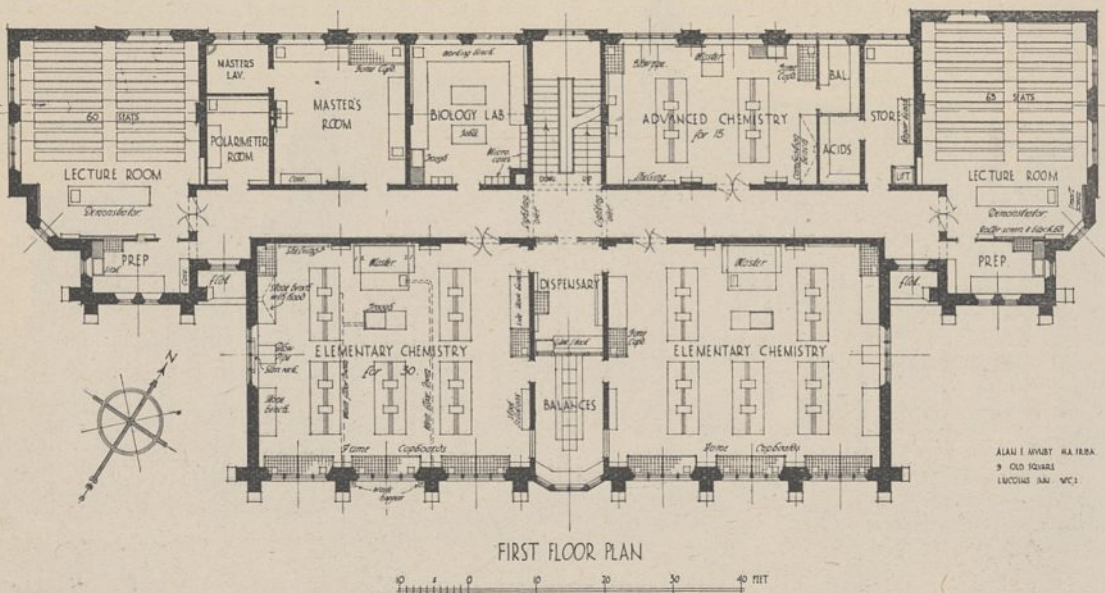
Plan of first floor of new Science School, Clifton College.
